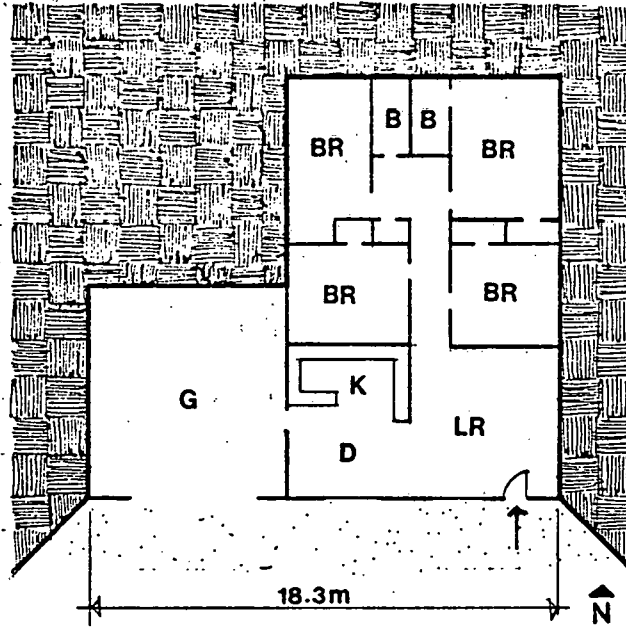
Site F is a non-insulated concrete structure, but has a suspended ceiling and interior furred wall construction.
